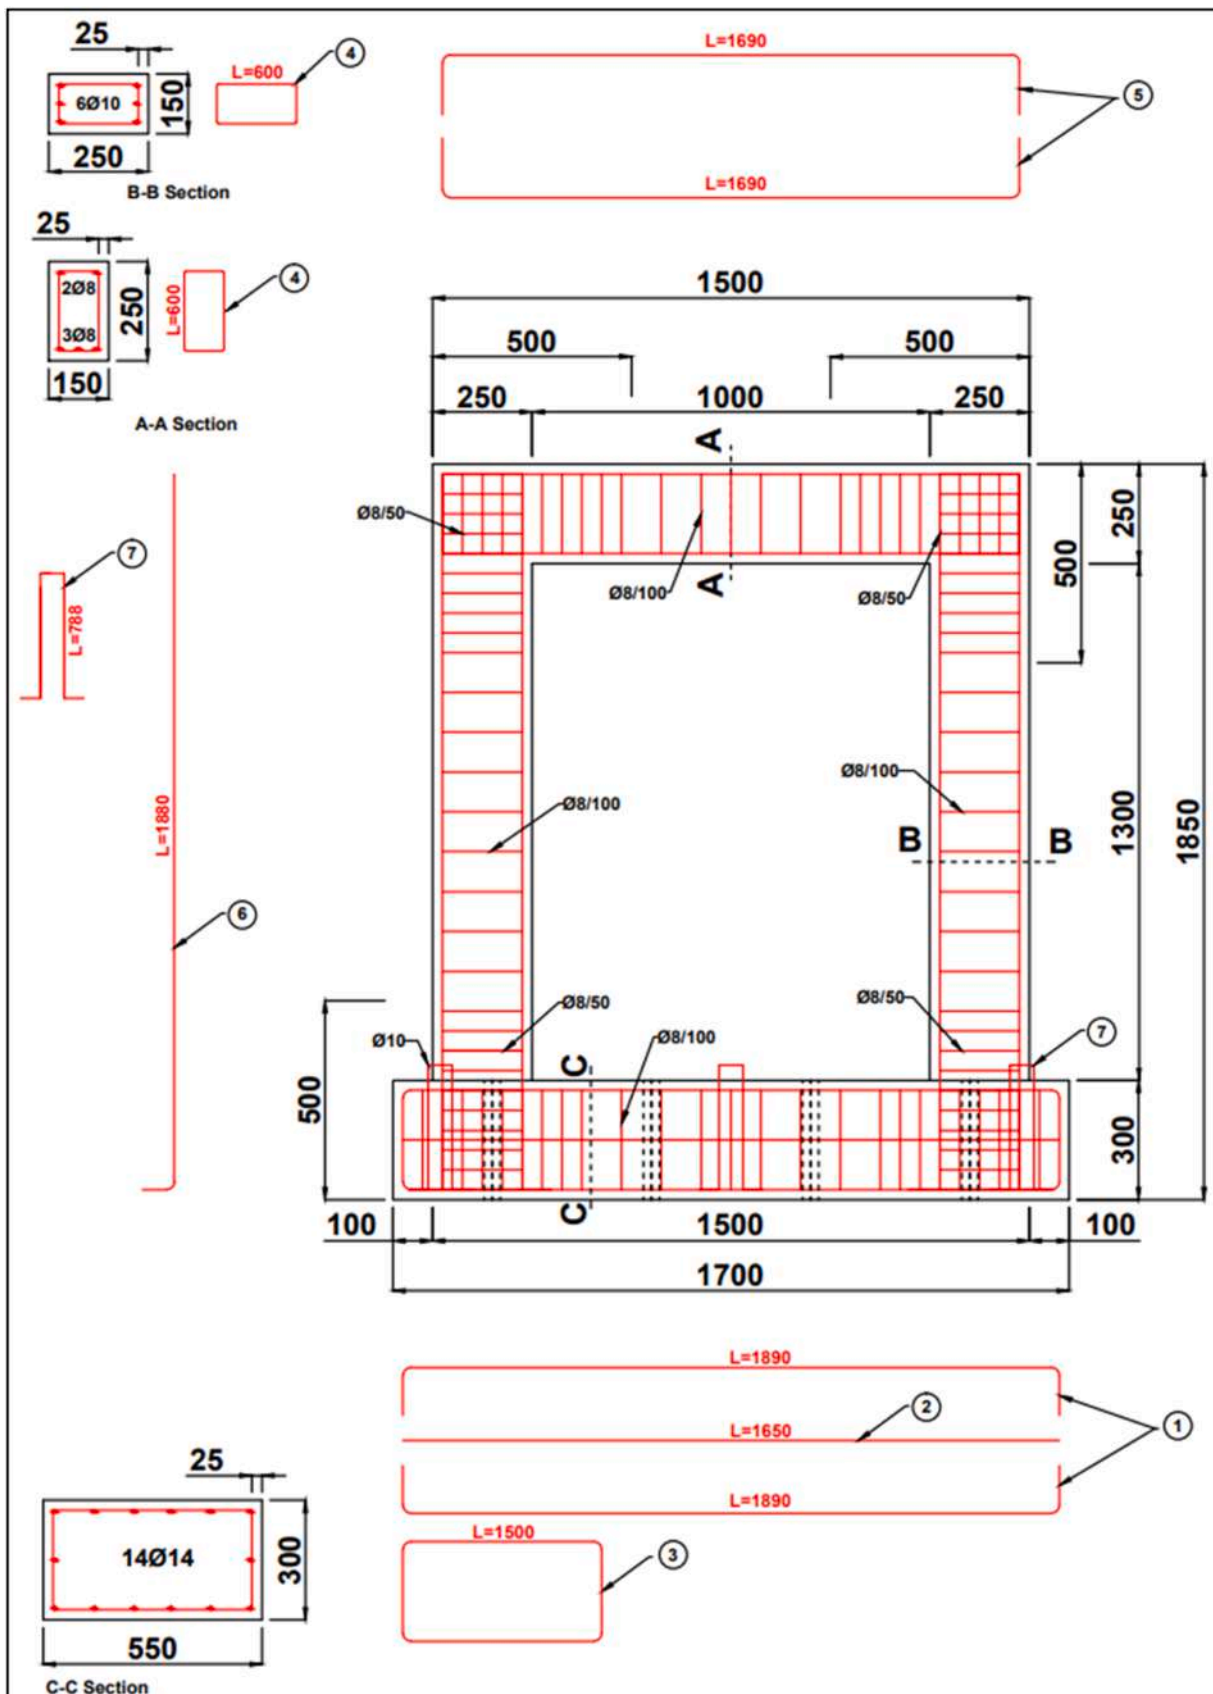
Reinforcement layout of the reinforced concrete frame test specimens.
